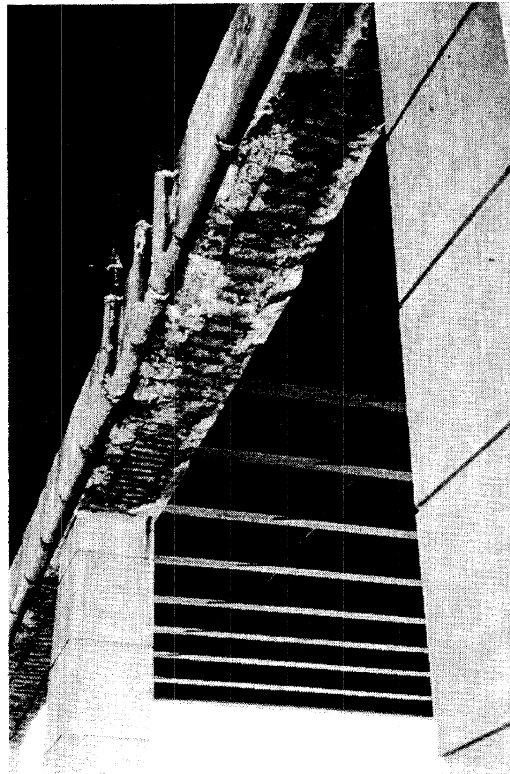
/ Typical Corrosion-Induced Distress in Bridge Columns
